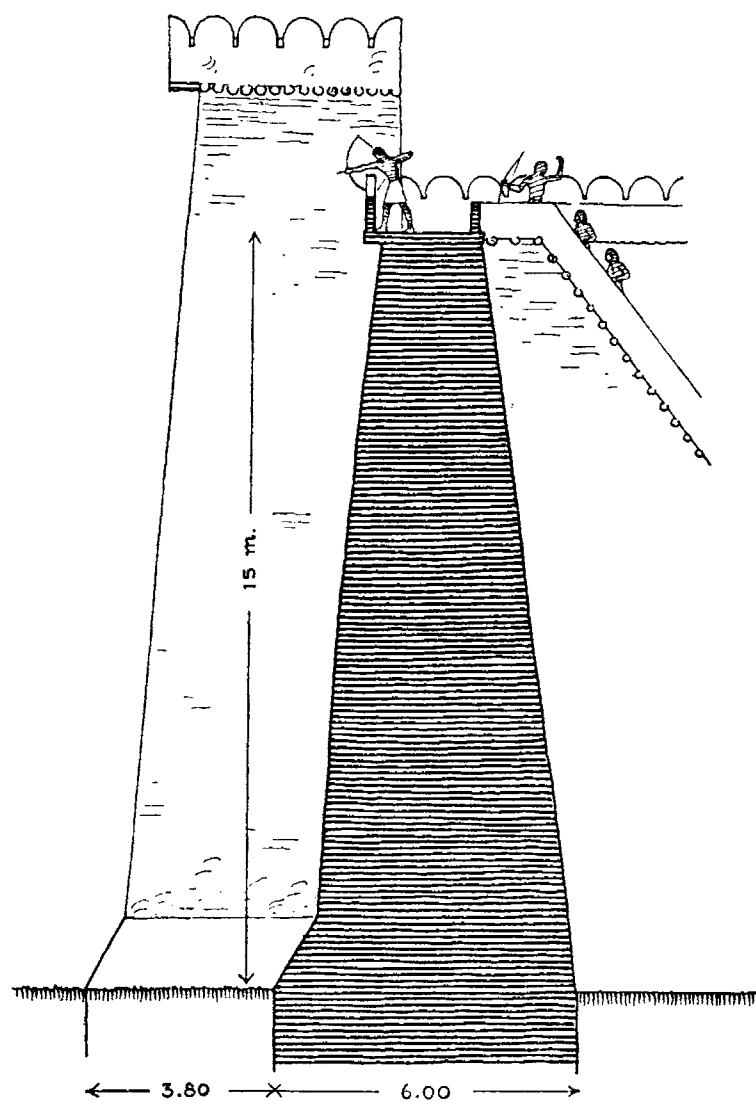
CROSS-SECTION OF THE INNER INCLOSURE WALL. RECONSTRUCTION
